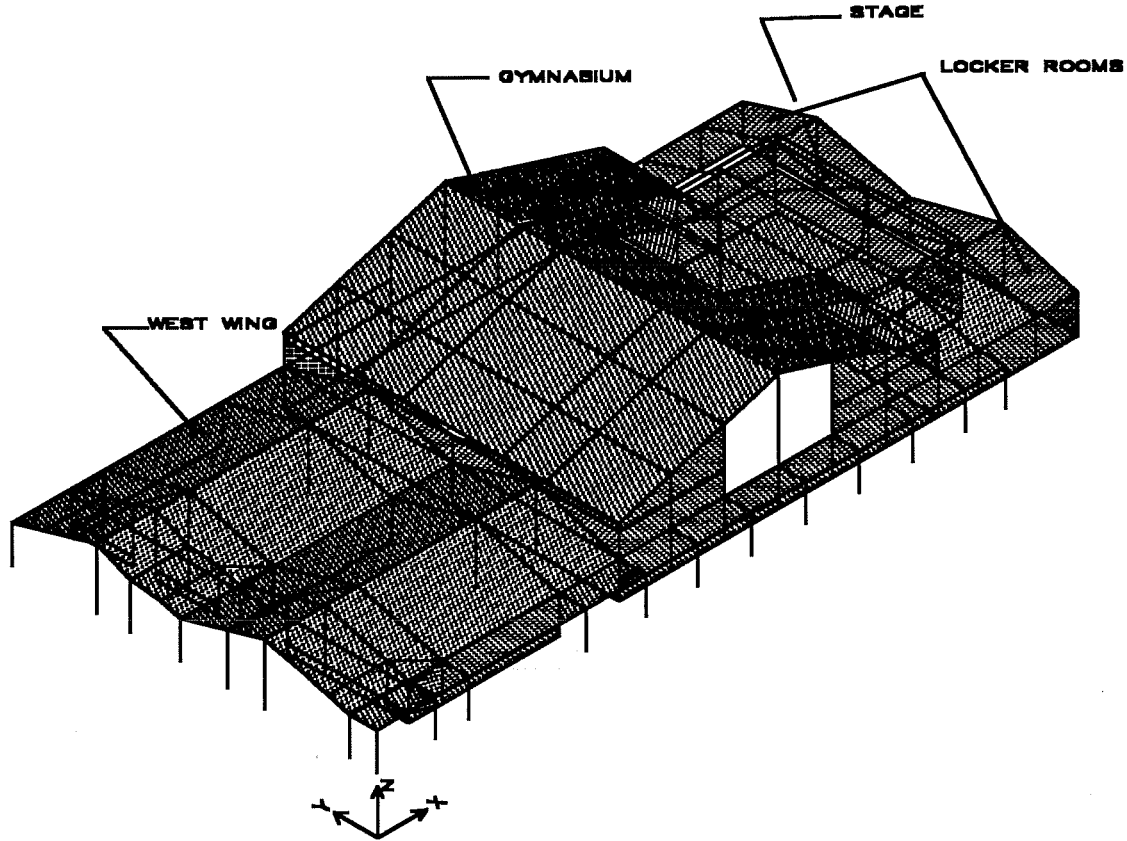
Loma Prieta Community Center - Three-dimensional view of the building model
